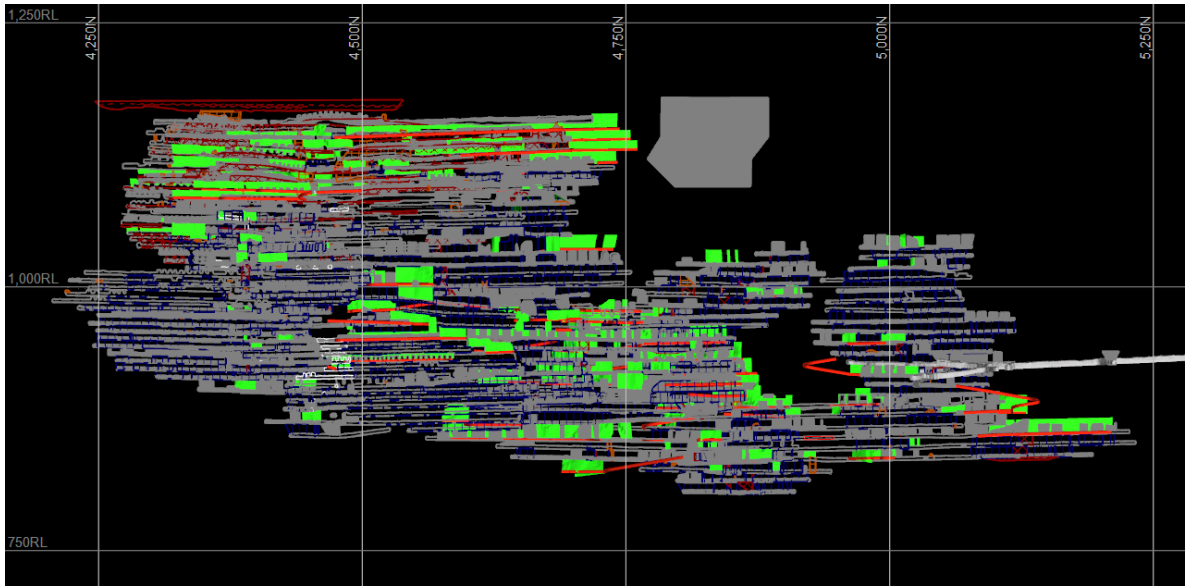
Long section of proposed Cuffley and Augusta mine design
